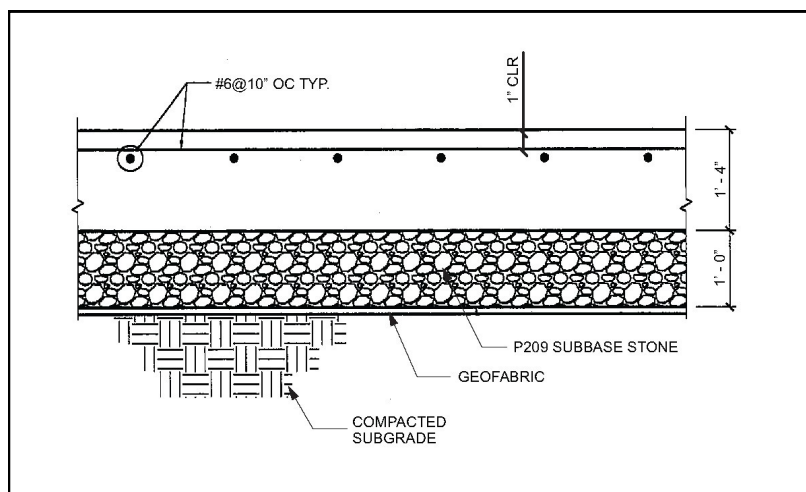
DESIGN CROSS-SECTION OF THE HANGAR SLAB
